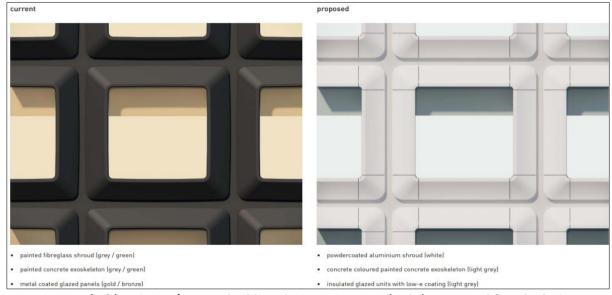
(left): Existing/current building design; Figure 2a (right): Proposed façade design
